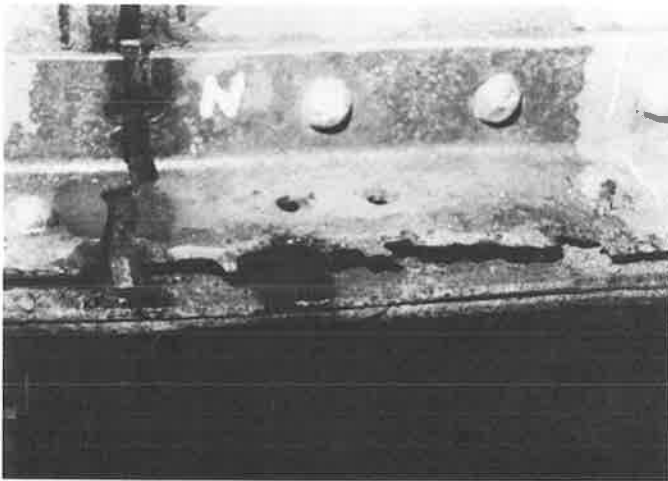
Fatigue Crack Initiated From Corroded Flange Angle
